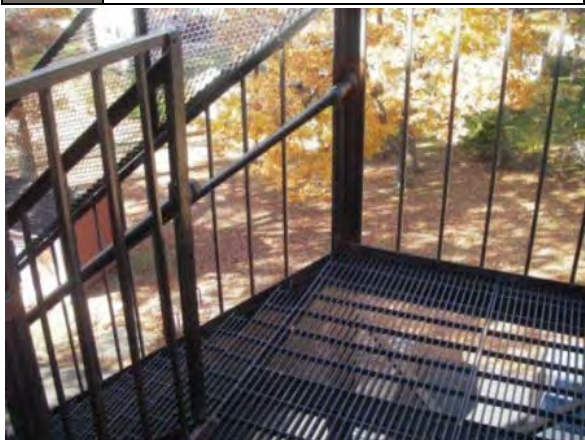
1902 BUILDING NORTH FIRE ESCAPE
